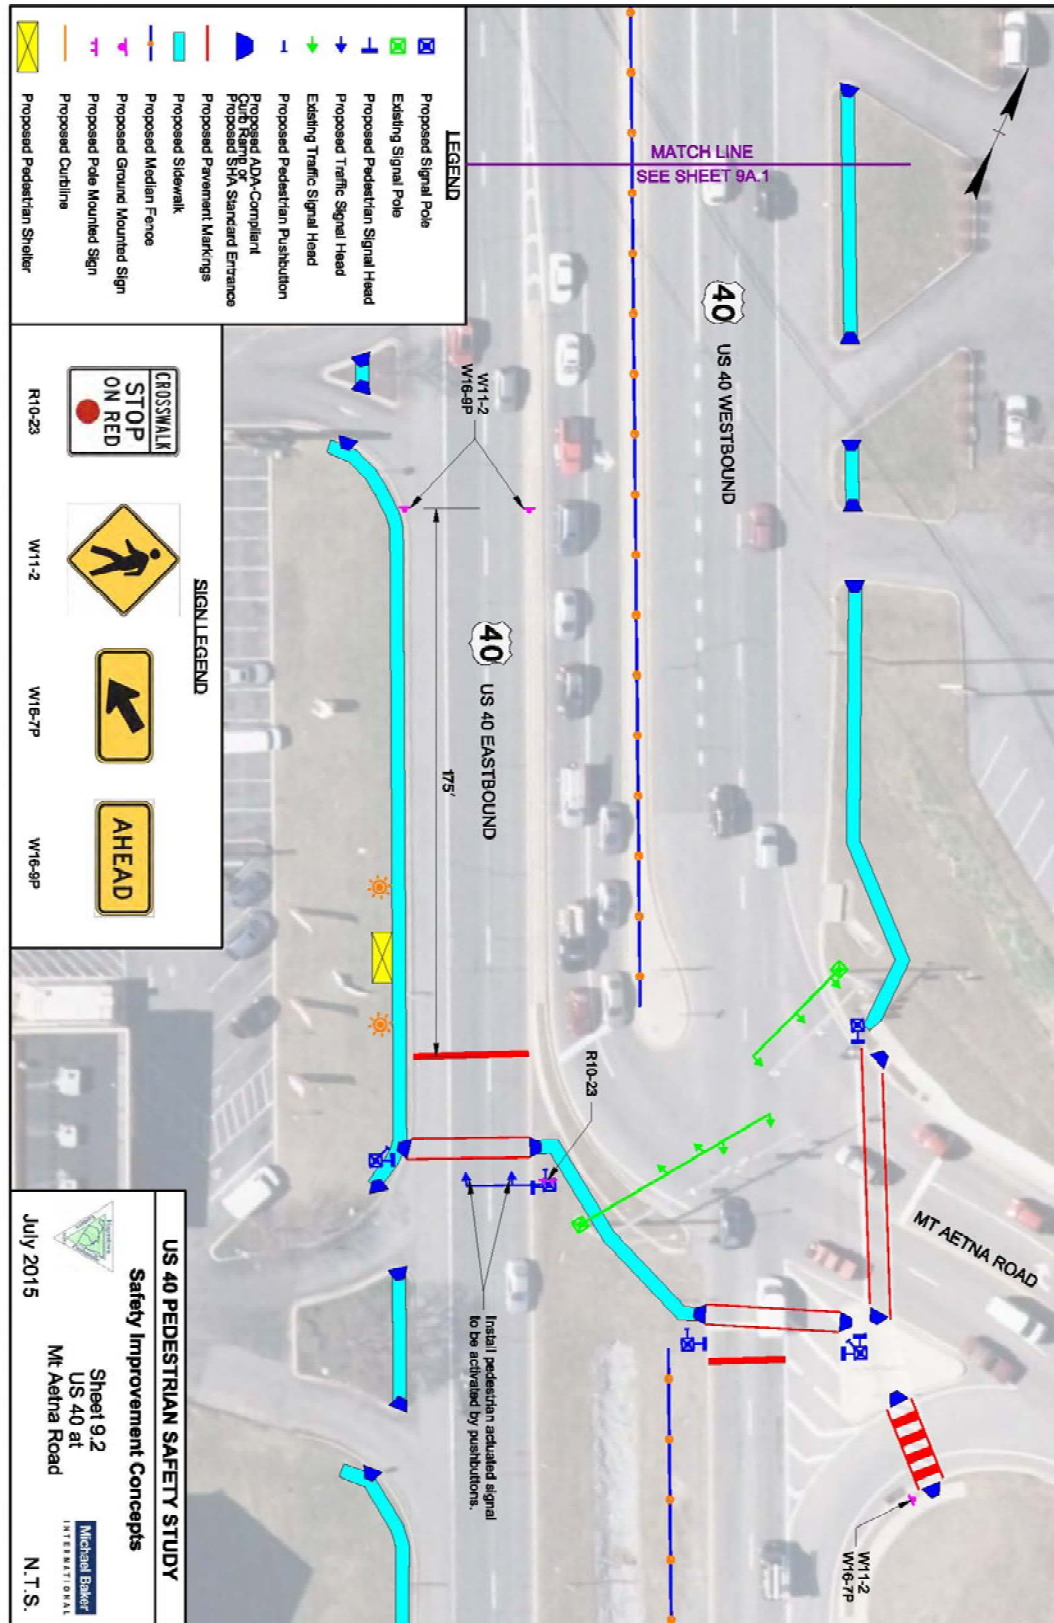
Safety Improvement Concept: US 40 and Mt. Aetna Road / Birch Knoll Road
